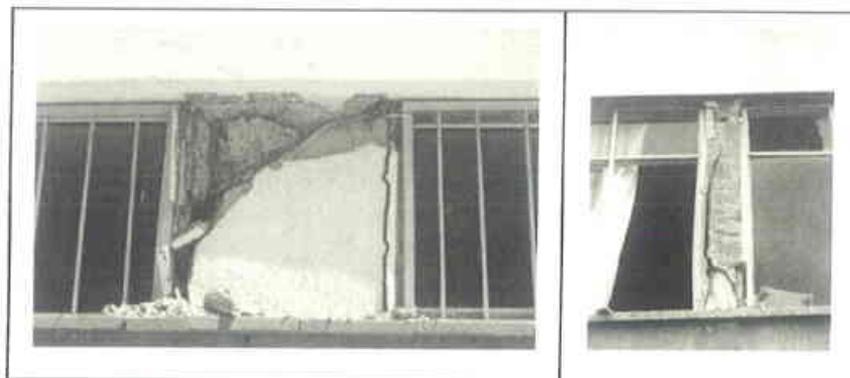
Shear failure in short captive columns 'trapped' between partial height infill, and flexural failure in non-ductile reinforced concrete plastic hinges
